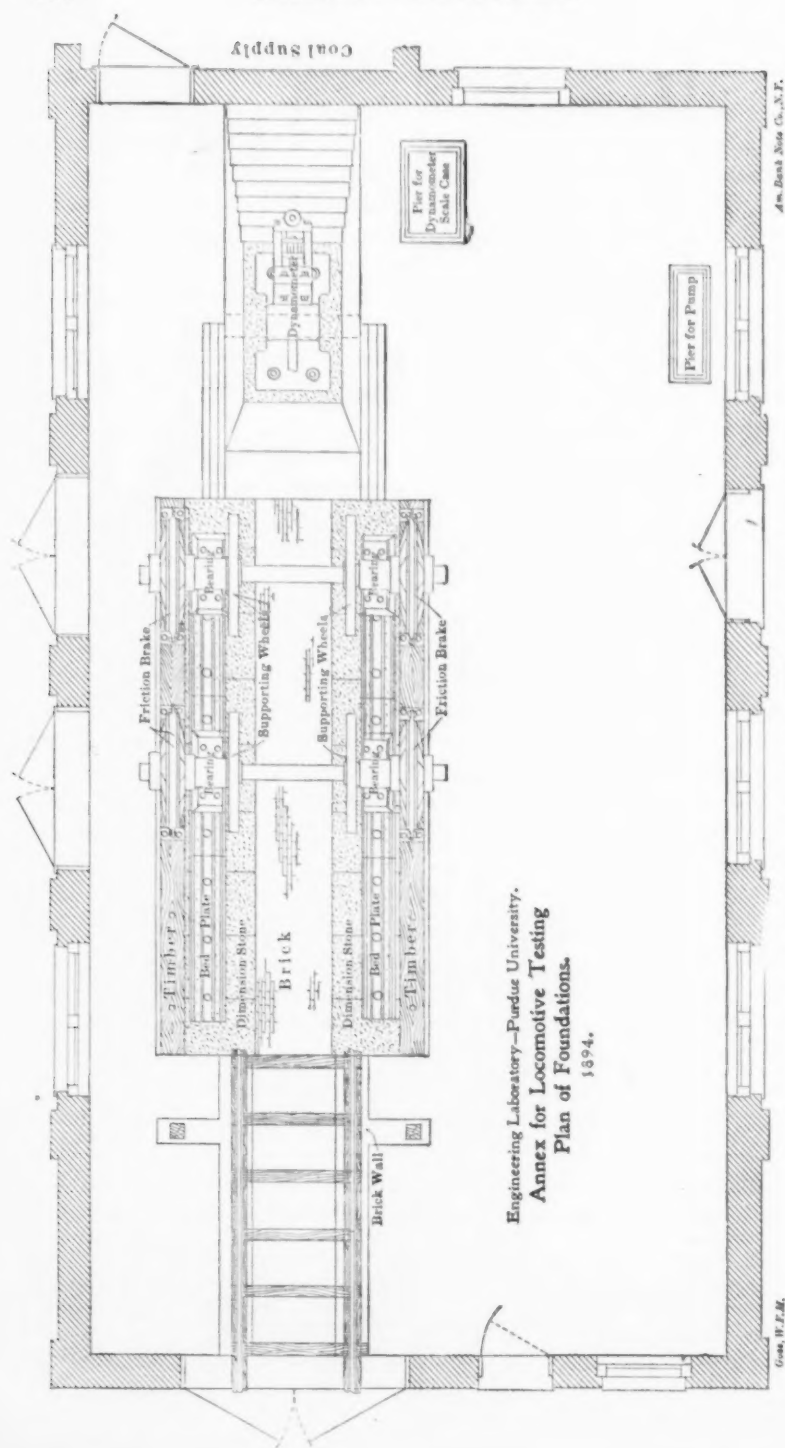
PLAN OF SECOND PURDUE PLANT.
